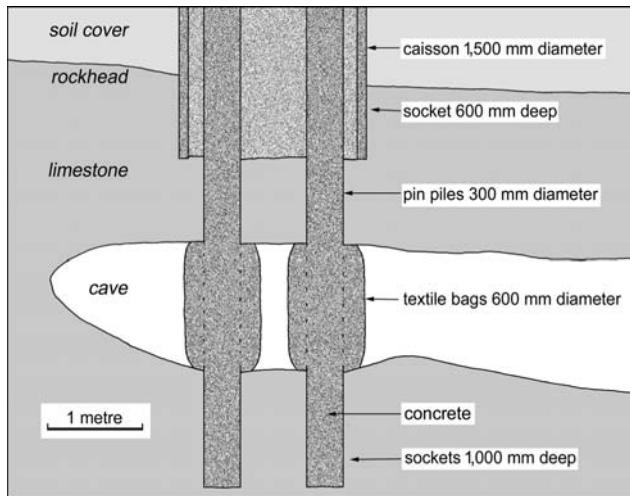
Textile bags used to form oversize concrete columns where a cast-in-place pile is bored through an open cave.
